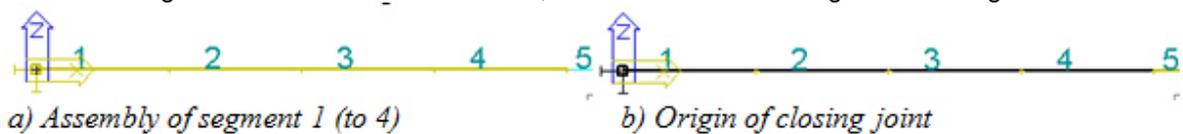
“Tangent” precast segmental cantilever construction, construction stages
